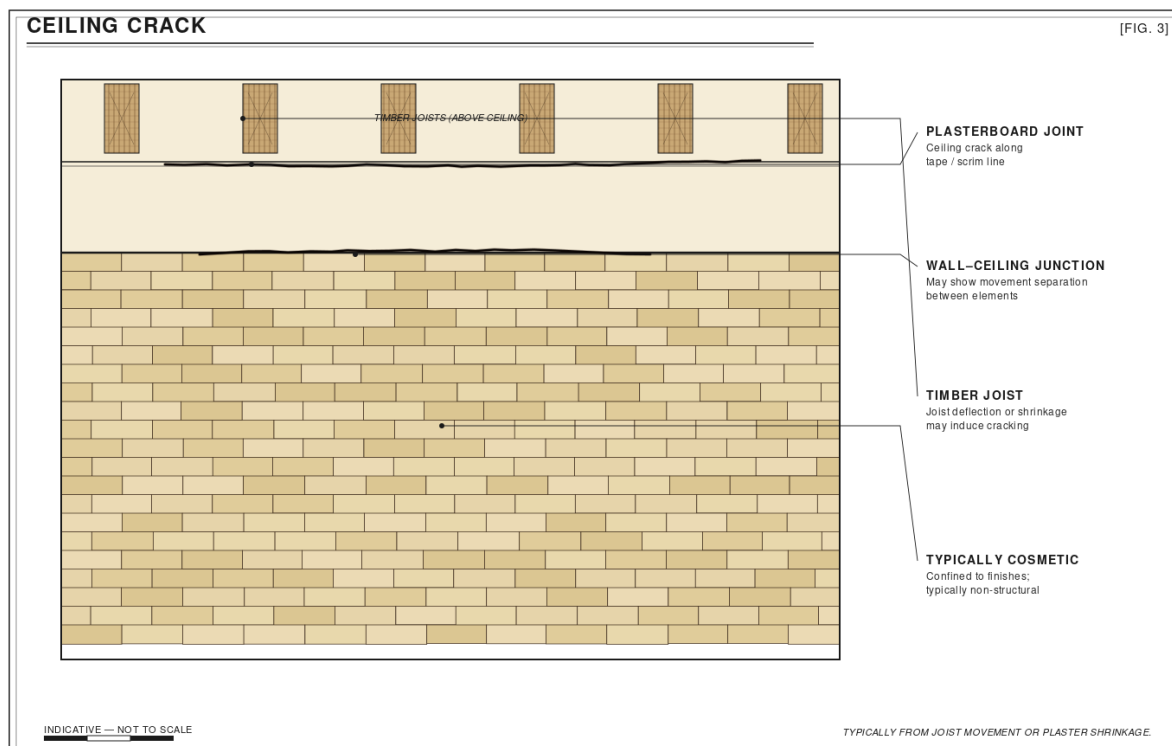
Plasterboard joint and wall-to-ceiling junction cracks.
